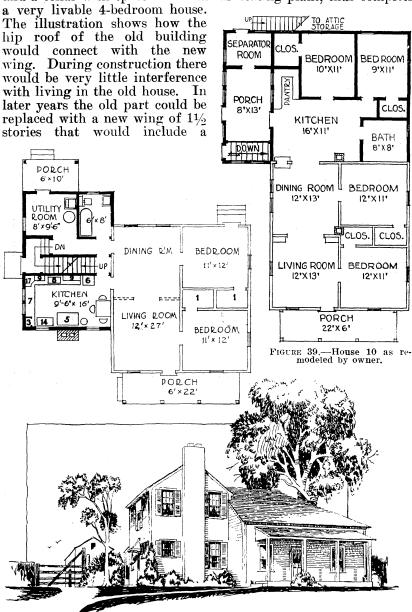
Alternate design for modernizing house 10. (Plan for second floor not shown.)
